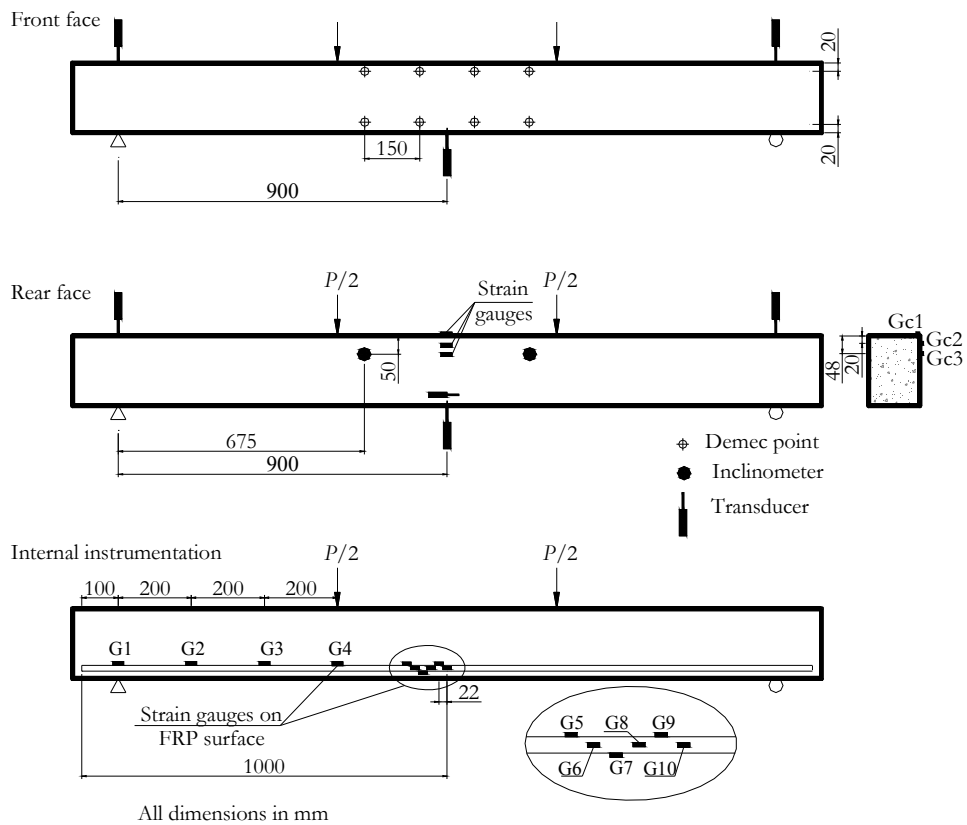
Instrumentation details for beam C2-216-D1-B.
